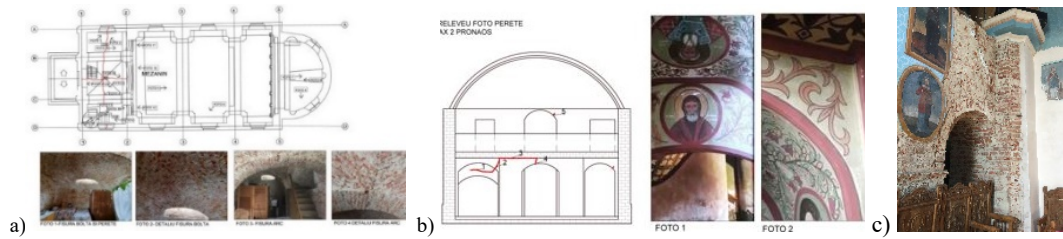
Structural damages identified on interior walls for: a) Berégsau Mare church; b) Chizatau church; c) Birda church
